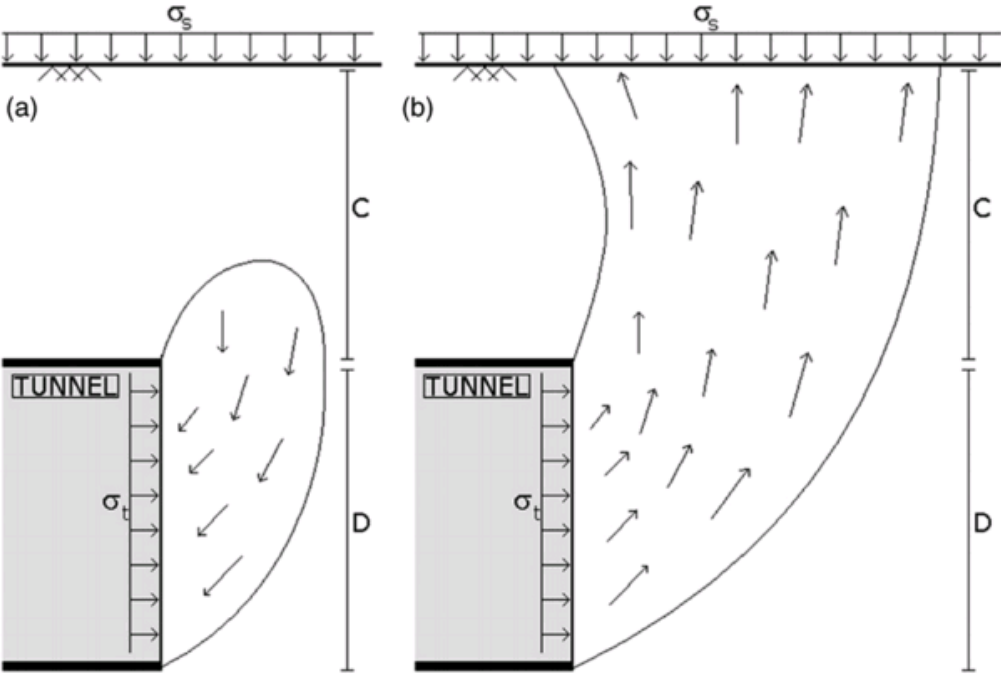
Typical tunnel face stability failure a) collapse, and b) blow out (Mollon *et al.*, 2013)
